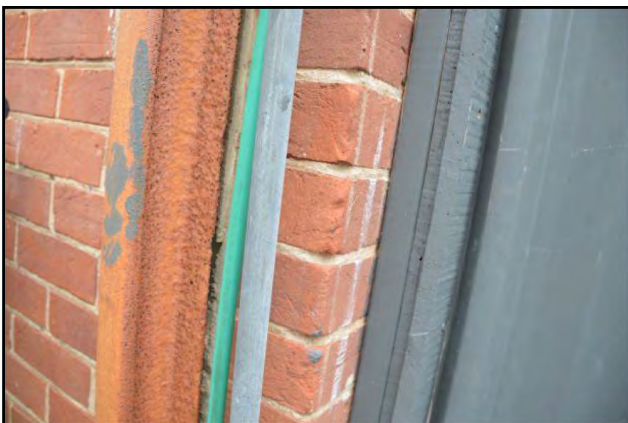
Corroded roof flashing and inadequate fixation
